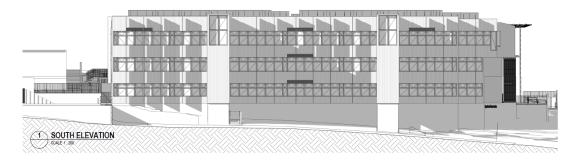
Approved Façade – Southern Elevation (DA 298-2016)
